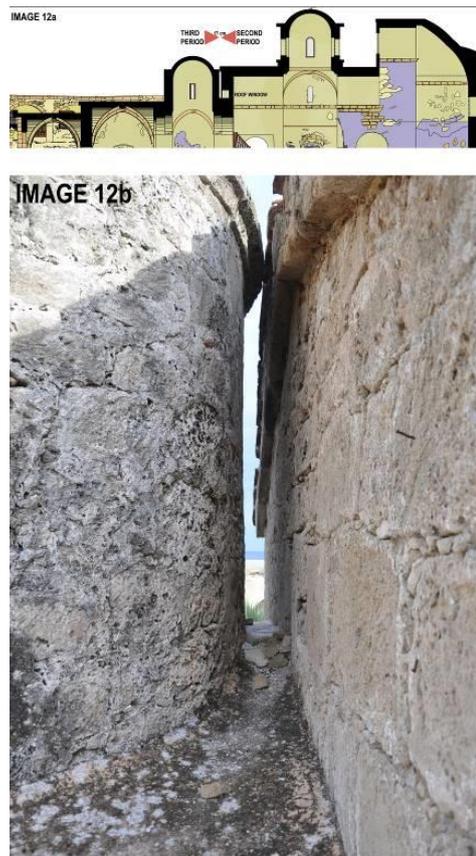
(a) Longitudinal roof section of the church building (b) image of the roof window
